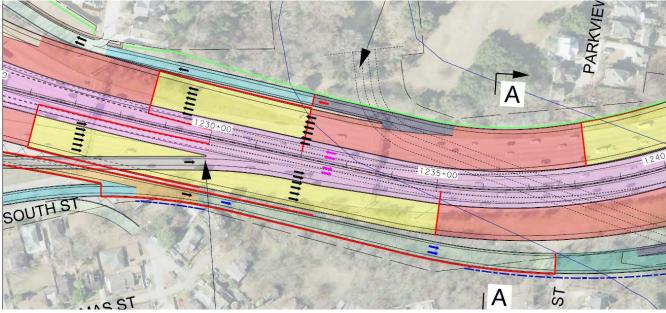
Local Access from Quitman St to I-45 Northbound Frontage Road
